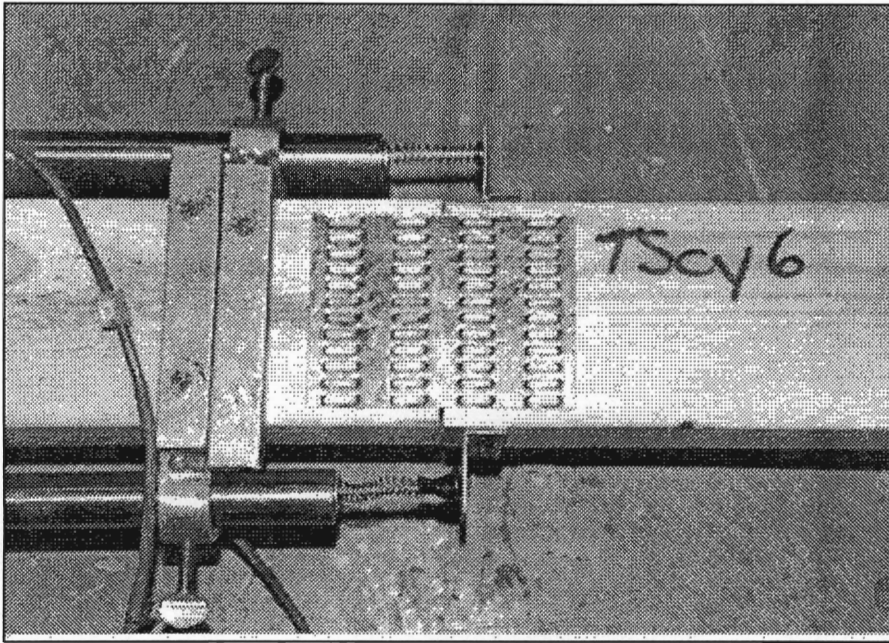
5. Tension-Splice Joint LVDT Layout.
